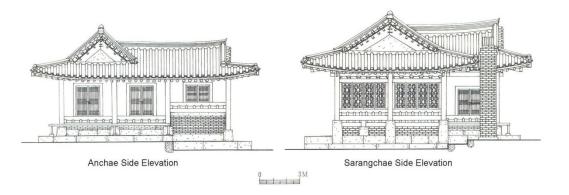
Anchae, Sarangchae Side Elevation (N. Zu 2003)
